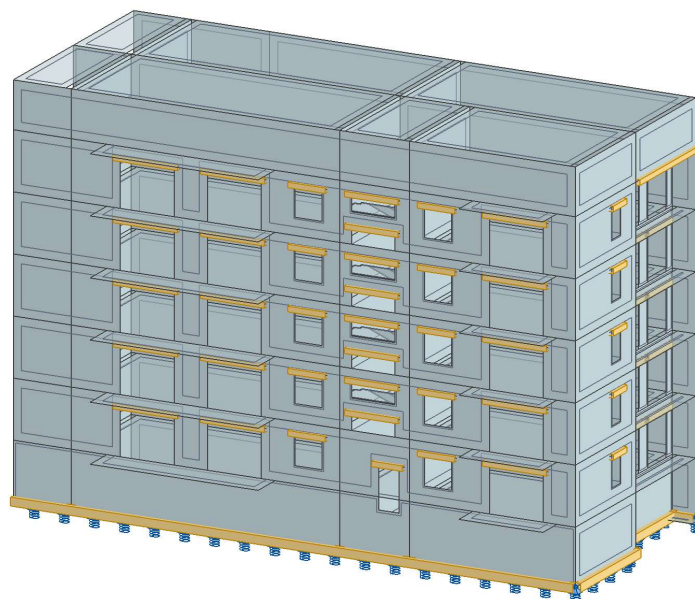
3D building's analytical model (pile foundation is set as elastic bearing)
